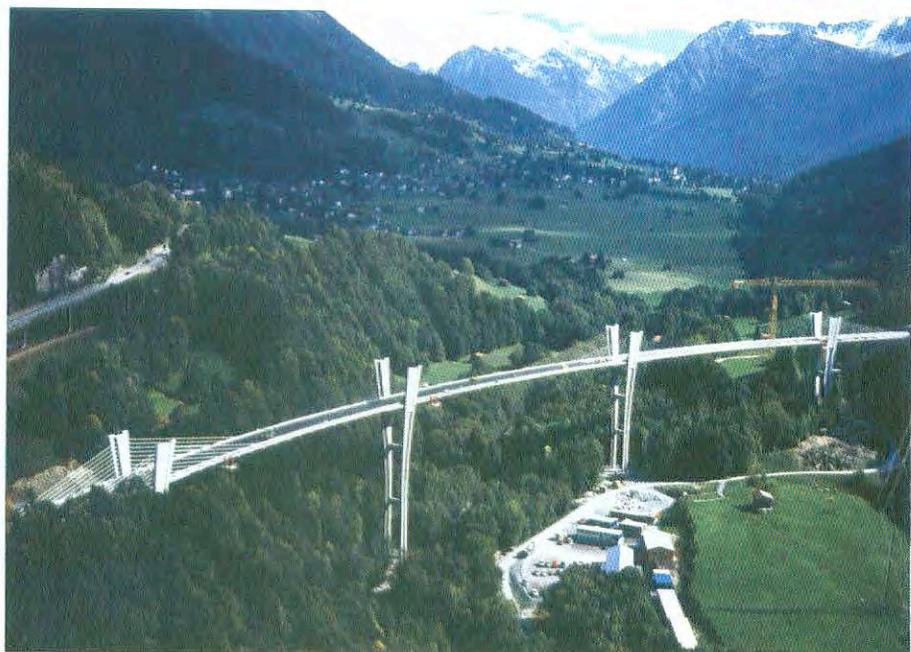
Sunniberg Bridge – Switzerland [14]
